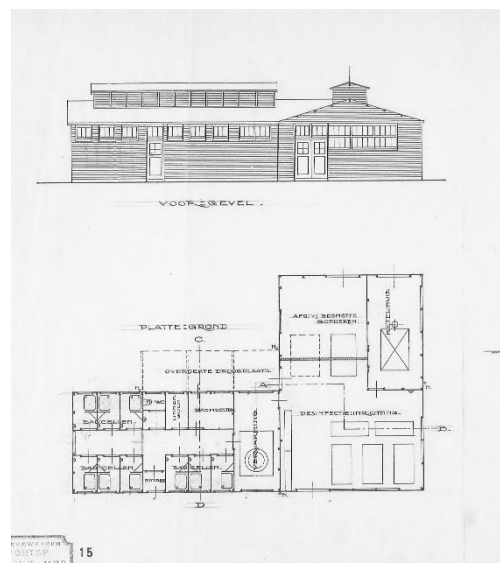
Floor plan of a decontamination building at Quarantine Station Zeeburgerdijk (Stadsarchief Amsterdam)
